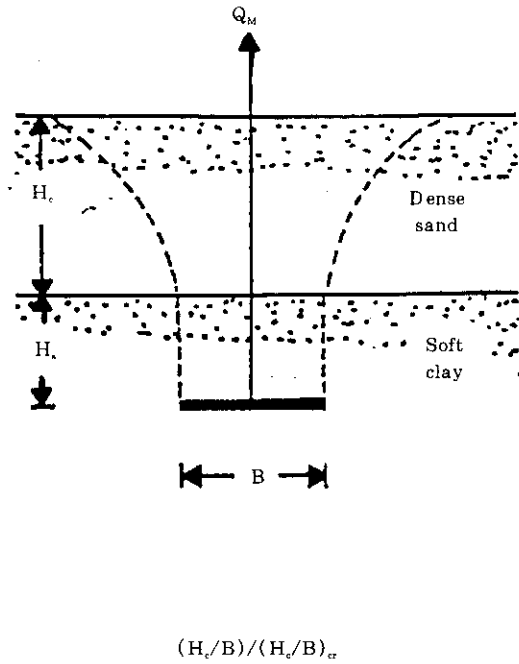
Assumed failure surface in soil at ultimate load for shallow anchor condition
